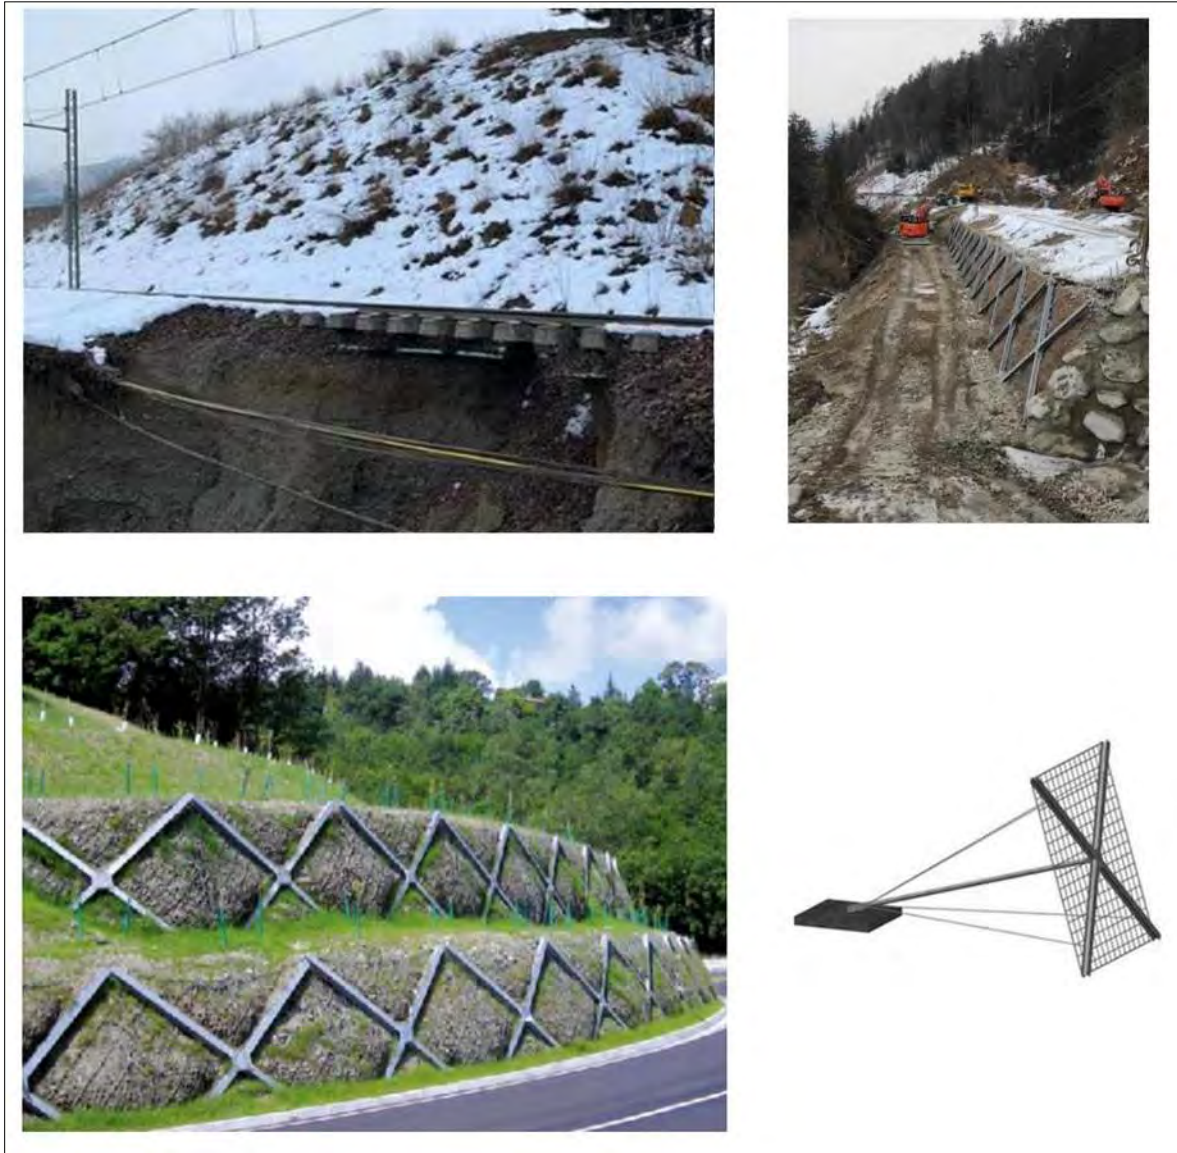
Pyramid-Shape Steel Frame Retaining Elements [95]
